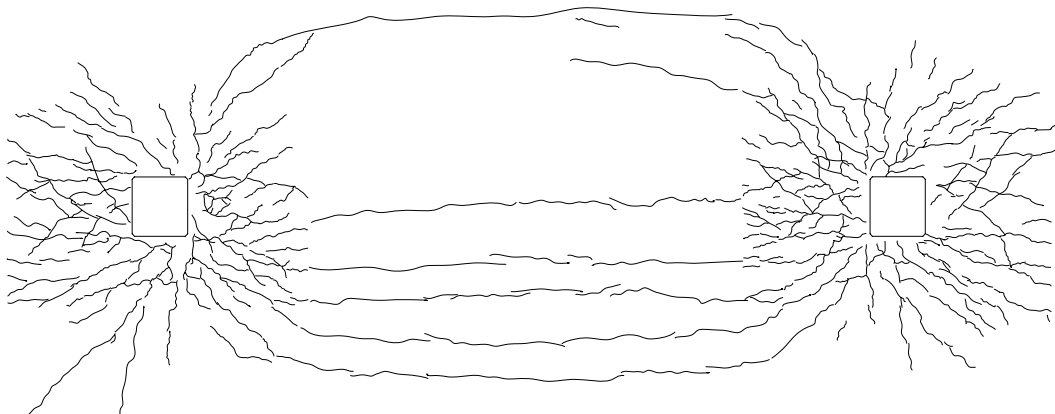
Level 3-2A and 2B Top Slab Cracks (North 3% Roof Drift)
